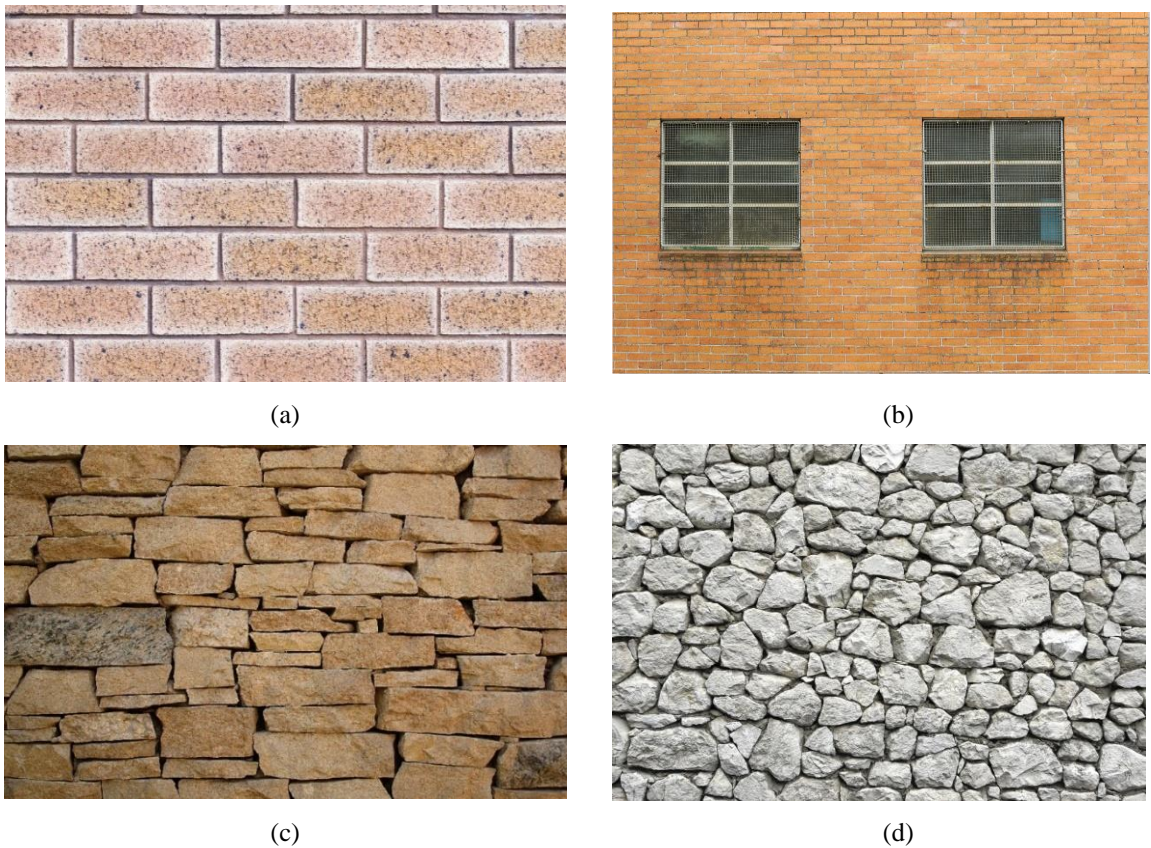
Masonry images used in this study: (a) A wall with a periodic arrangement of rectangular bricks (Shaun 2020); (b) A masonry wall with openings (Paine 2018); (c) A masonry wall with irregular-shaped bricks (Belemmi 2012); and (d) A rubble masonry wall with irregular-shaped bricks (Buzzle 2021).
